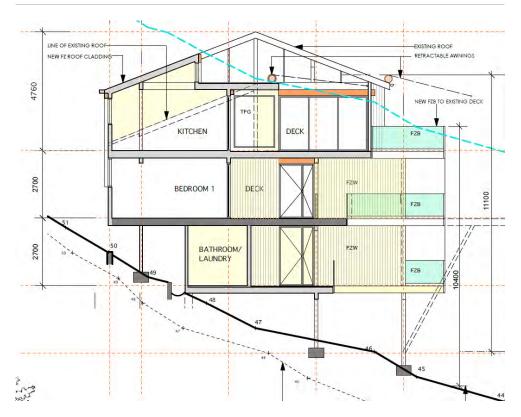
Building section indicating proposed retractable roof awning and which demonstrates extent of variation to statutory height limit when assessed against the existing ground line through the site
